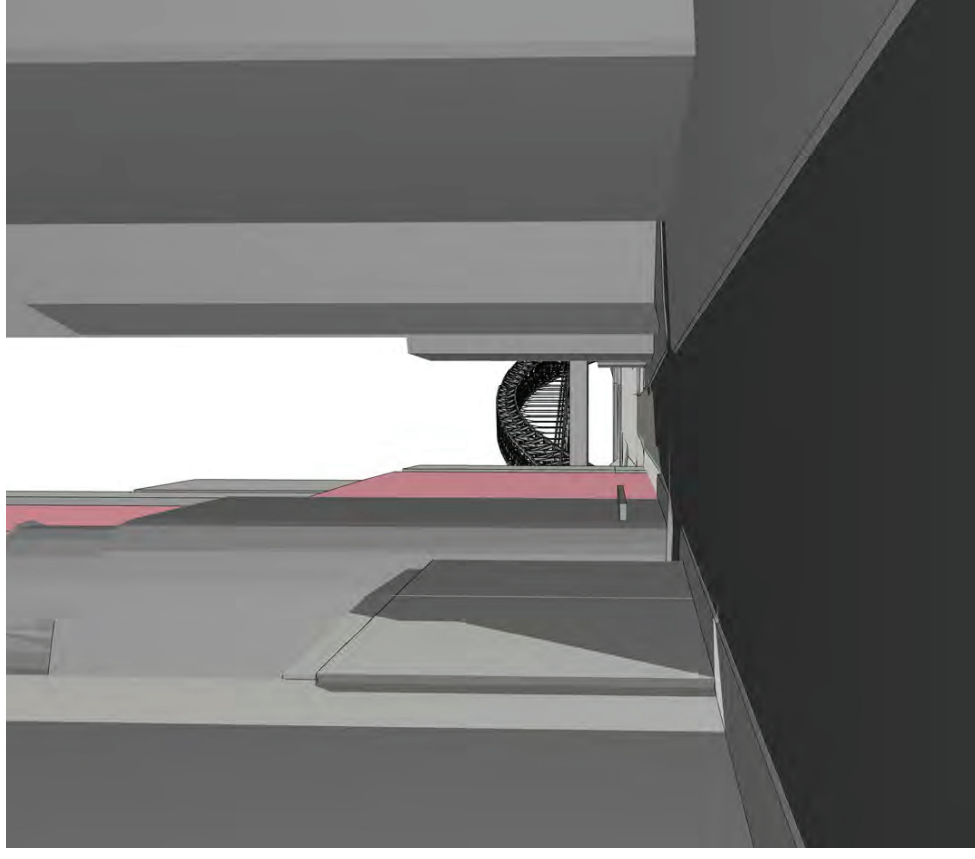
View from Model - Proposed Envelope with 33-35 Pitt Street DA Stage 2.
